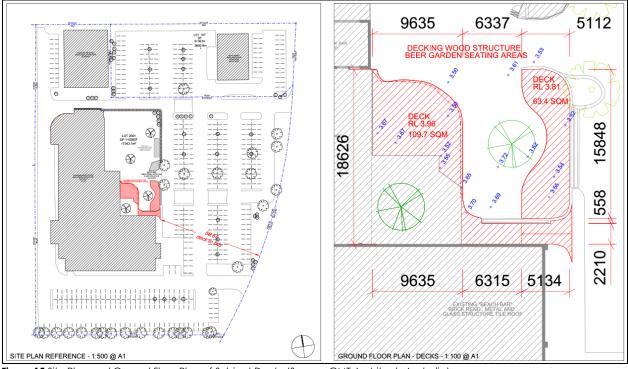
Site Plan and Ground Floor Plan of Subject Decks (Source: CMT Architects Australia)
